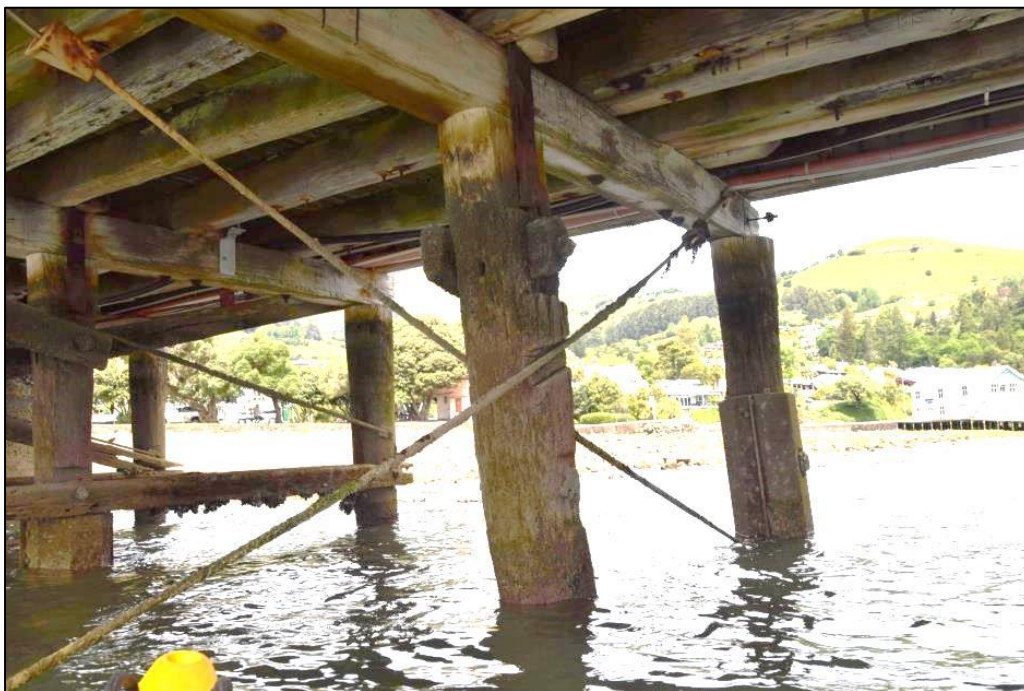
An example of repairs and alterations to a bent – original timber bracing cut off either side of the central pile; diagonal steel braces installed; and a steel jacket added to the right-hand pile (Origin 2021)
